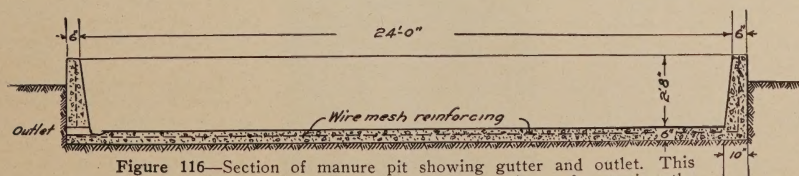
Section of manure pit showing gutter and outlet. This outlet should be connected to a sump pit or cistern for storing the liquid manure.
